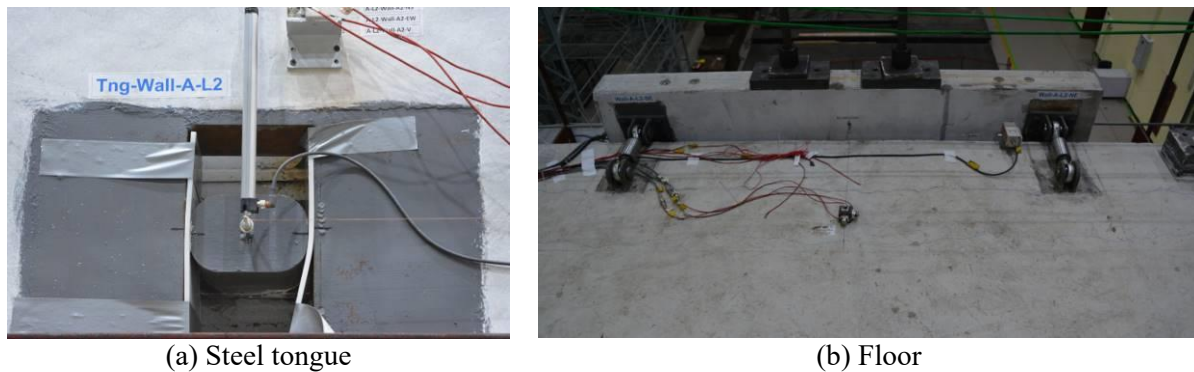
Final condition of the isolated wall-to-floor connection at Wall A level 2
